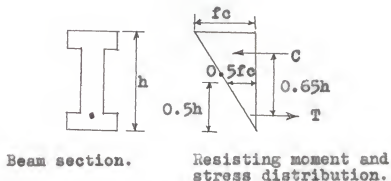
PRELIMINARY DESIGN OF A BEAM SECTION.
